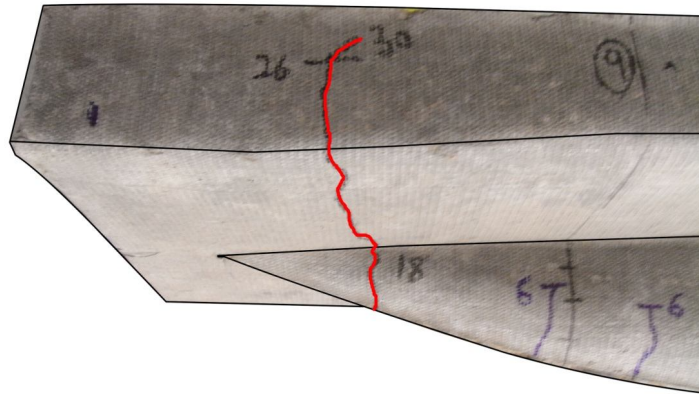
Showing vertical bending crack becoming diagonal shear crack-22SADF3no10mm
